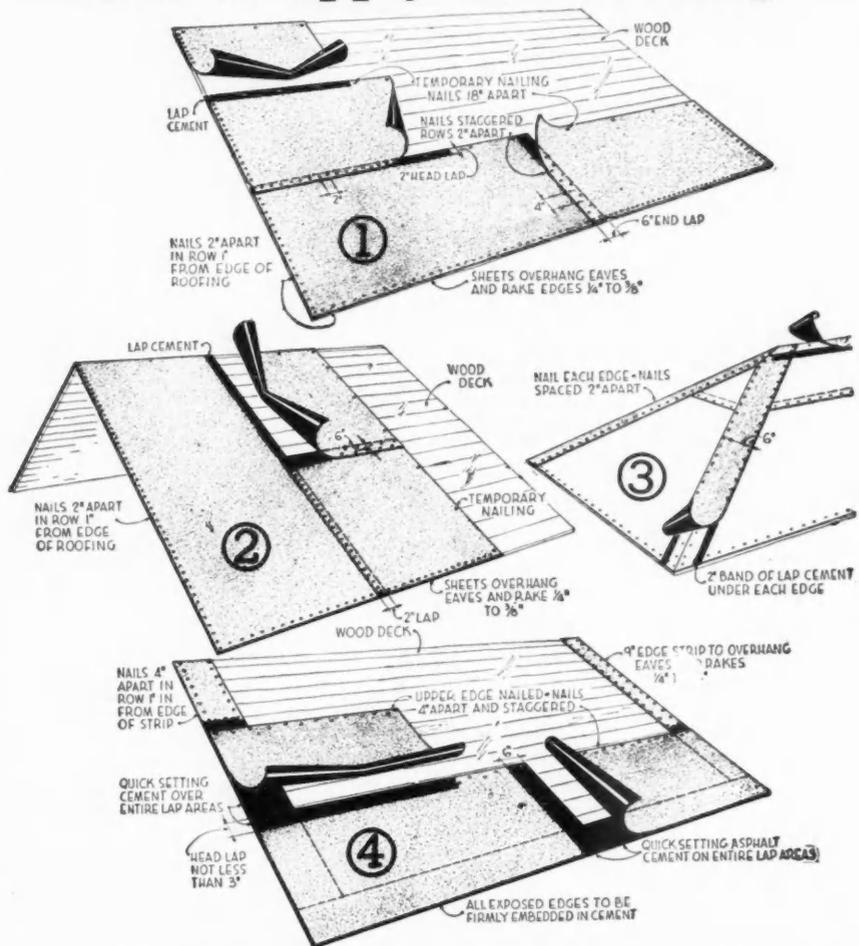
illustrates the exposed nail method, parallel to eaves. Figure 2 also shows exposed nail method, parallel to the rakes. Figure 3 is the exposed nail method, hip and ridge application. Figure 4 shows concealed nail method, parallel to the eaves
